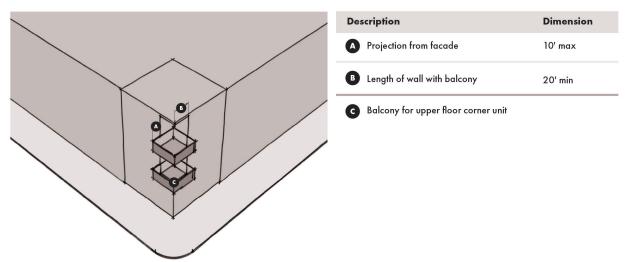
K: BALCONY AND GROUND FLOOR PATIO DIMENSIONS
